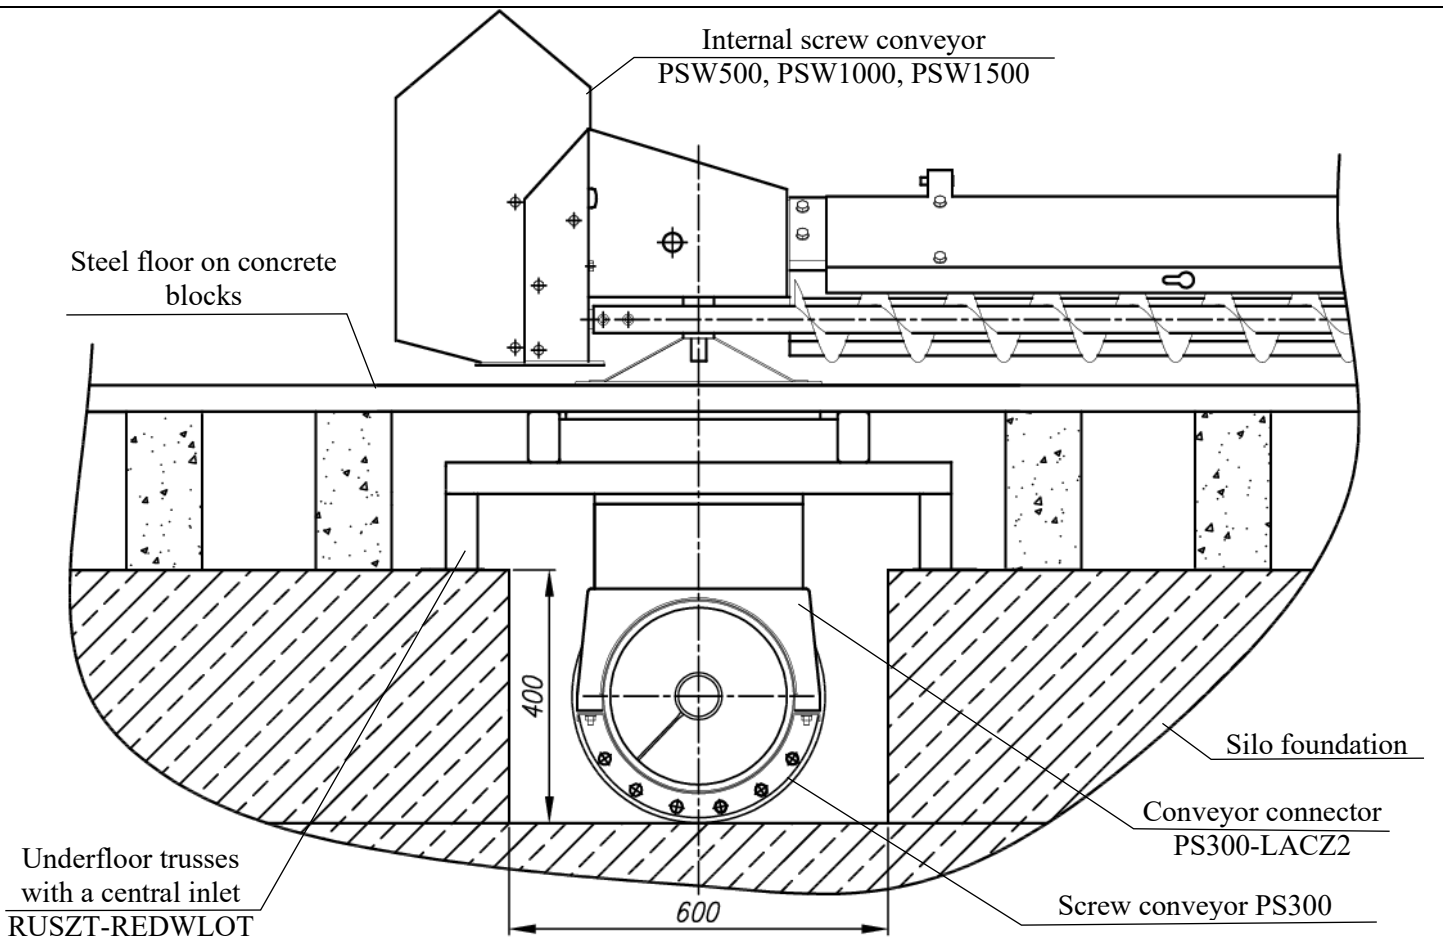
A method for connecting the PS300 conveyor with PSW500, PSW1000, or PSW1500 using the connector PS300-LACZ2, a floor on concrete blocks, and underfloor trusses with the central inlet RUSZT-REDWLOT.
